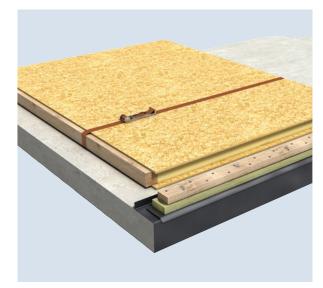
Bring Wall Panels Together Using Ratchet Straps
